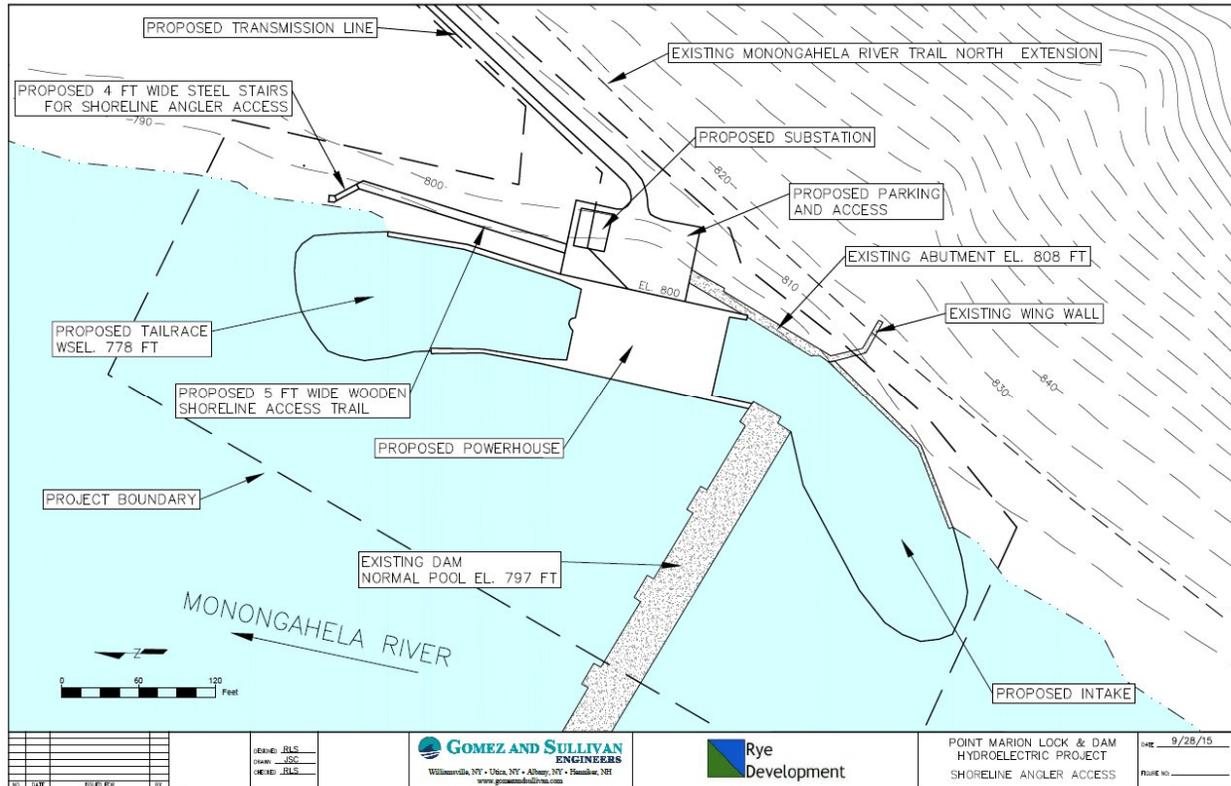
Recreation enhancement conceptual design plans, Point Marion (Source: Rye Development, 2015g).
